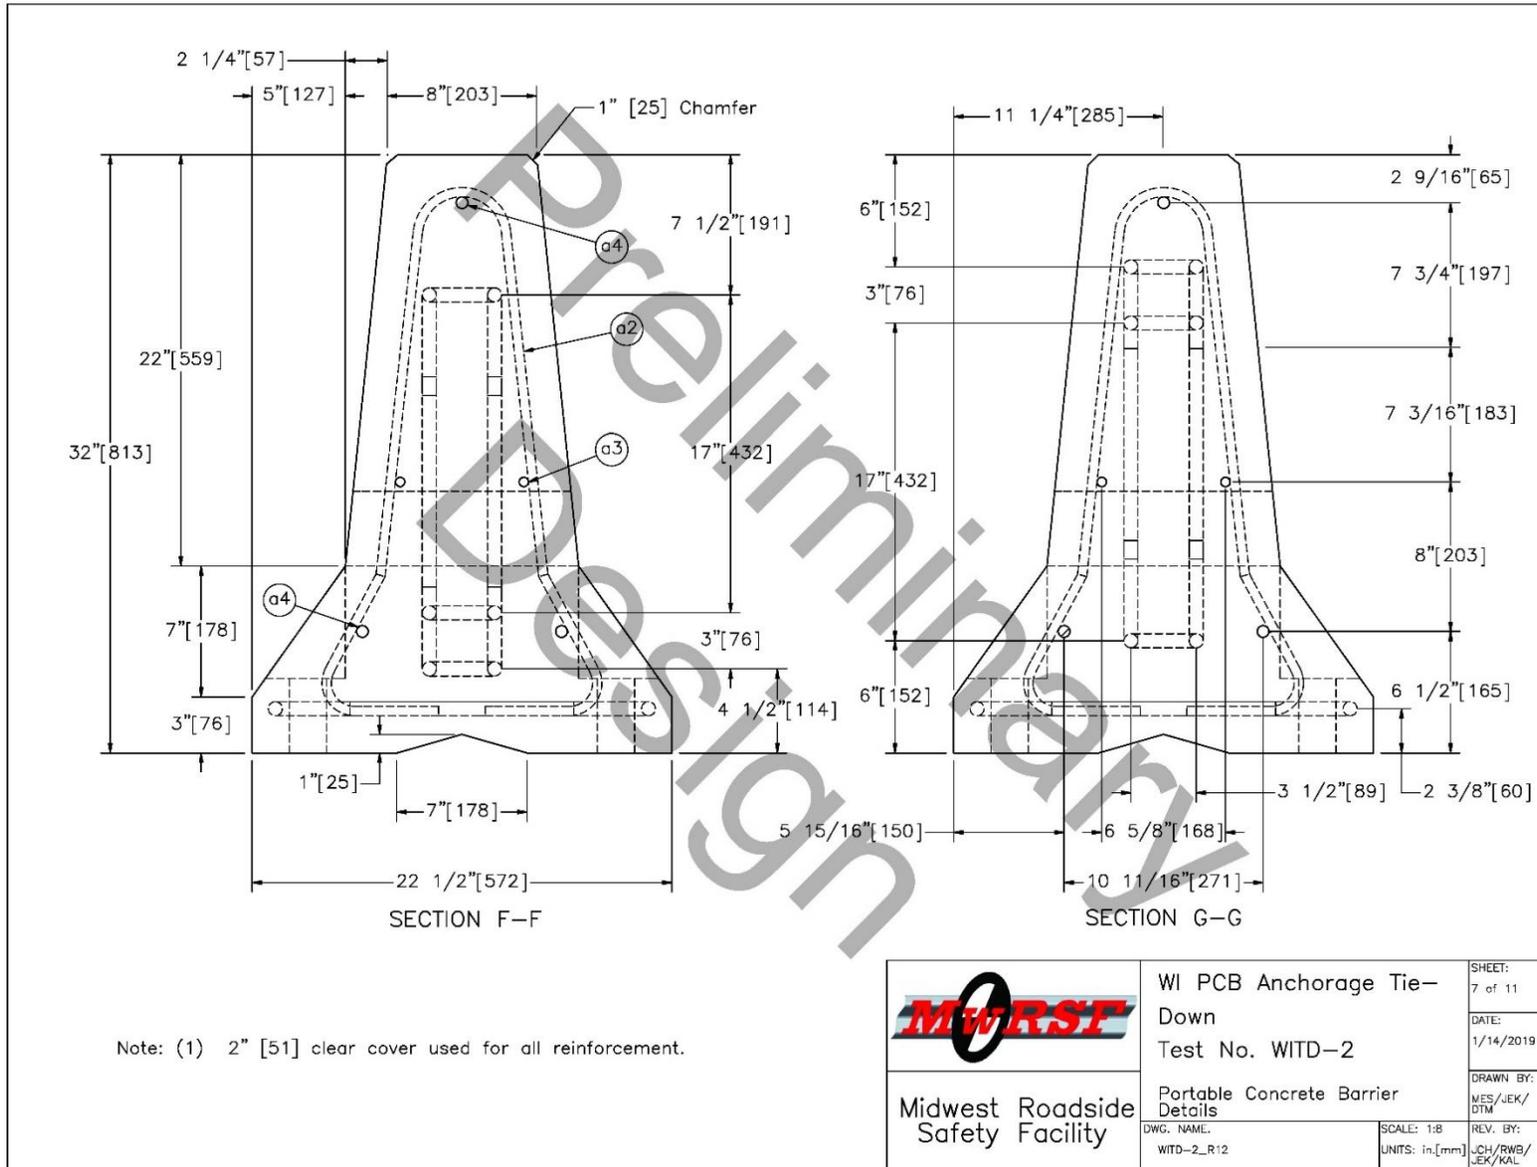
Portable Concrete Barrier Details, Test No. WITD-2
